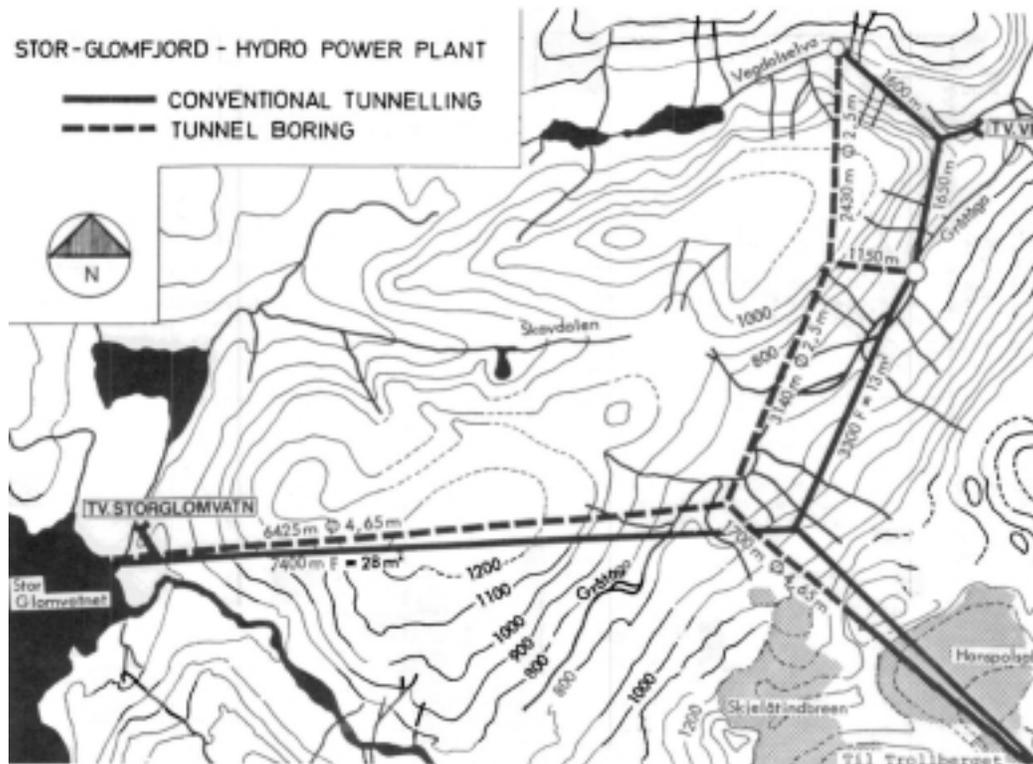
Stor-Glomfjord hydro power project. With tunnel boring one adit including road building can be saved (in the north-eastern part of the project).
